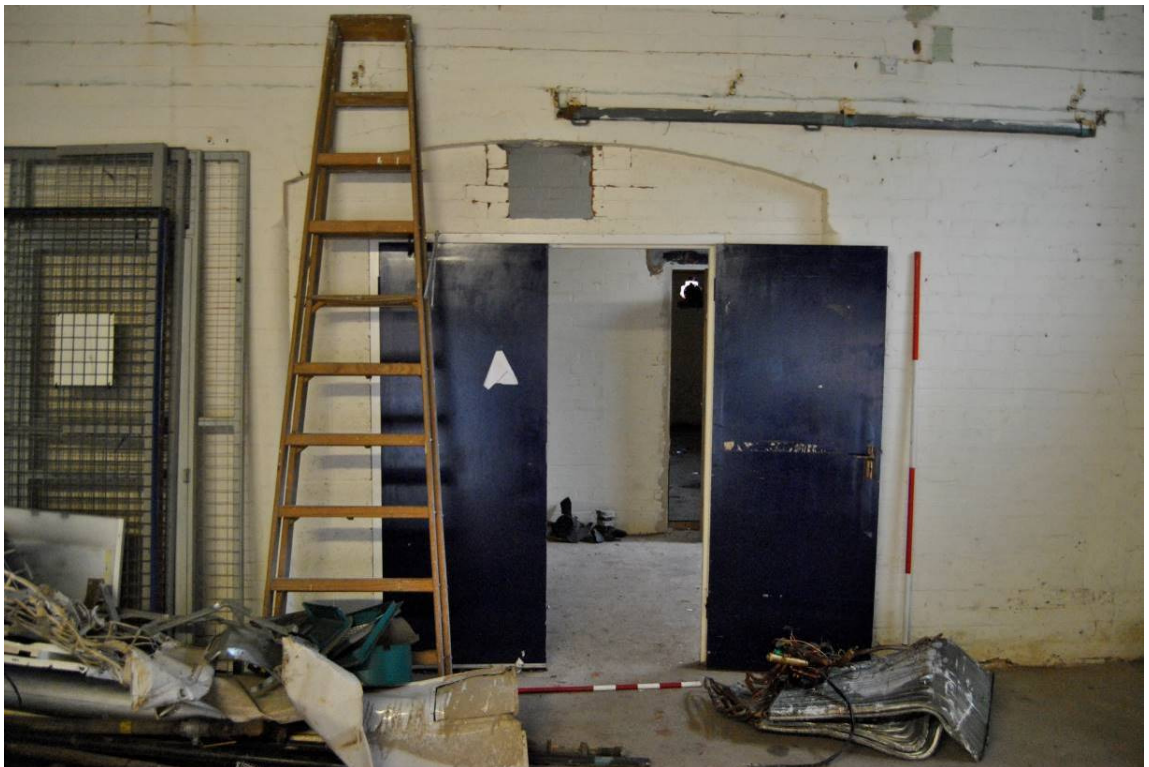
Original doorway (reduced) at Bay 5/6 (S) opening onto contemporary Building P.
